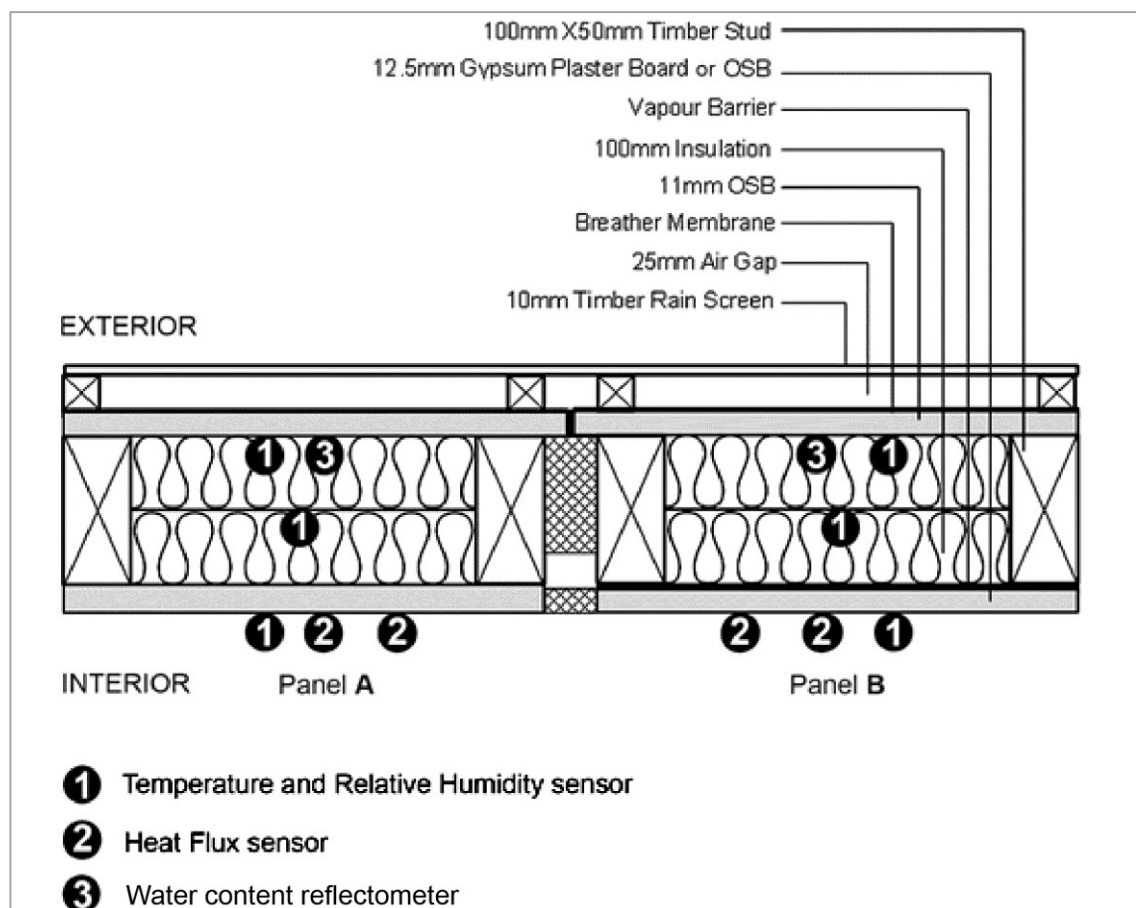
Horizontal cross section showing panel A and panel B and sensor locations in assembly-1.
